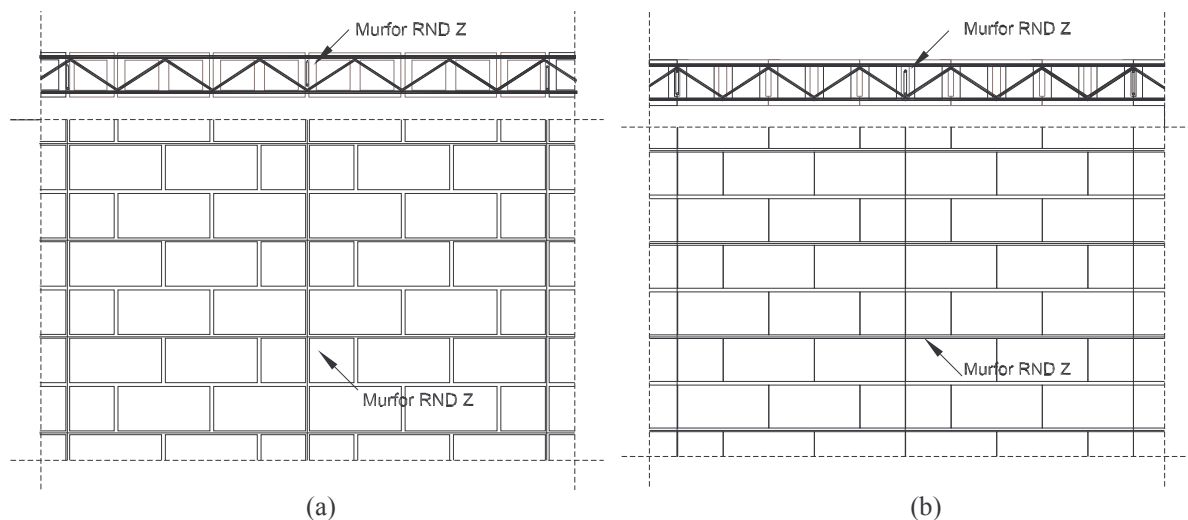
Constructive systems based on the use of concrete units; (a) two hollow cell concrete units, BS1; (b) three hollow cell concrete units, BS2
